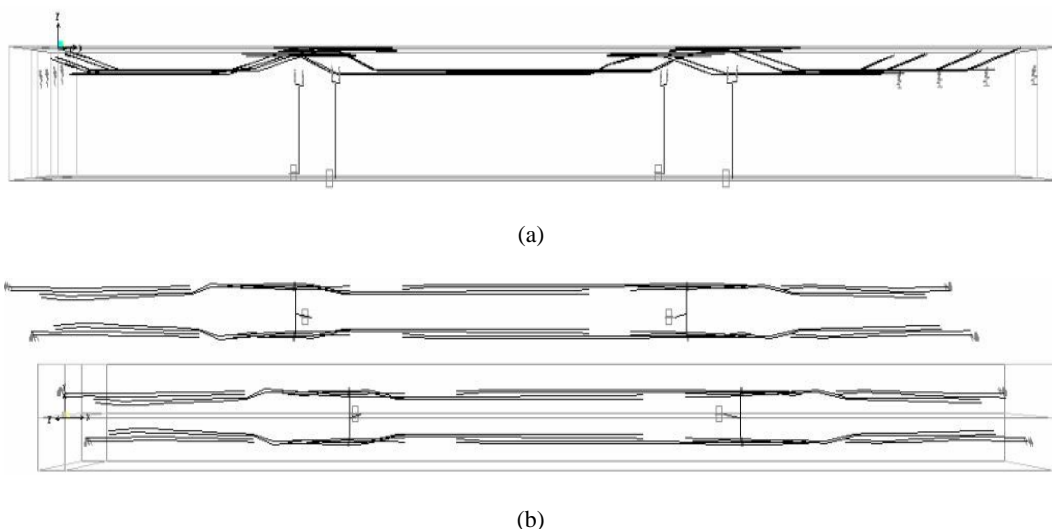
The layout of longitudinal pre-stressed tendons; (a) elevation view, (b) top view
